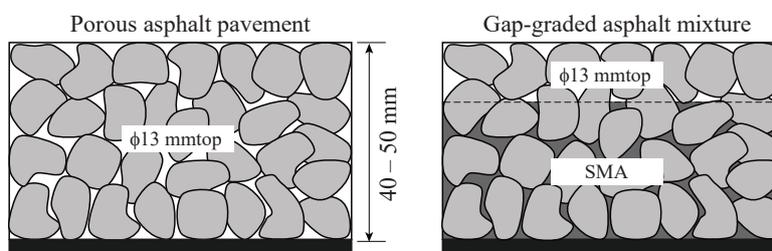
Schematic of porous asphalt pavement and gap-graded asphalt mixture (GGAM).
